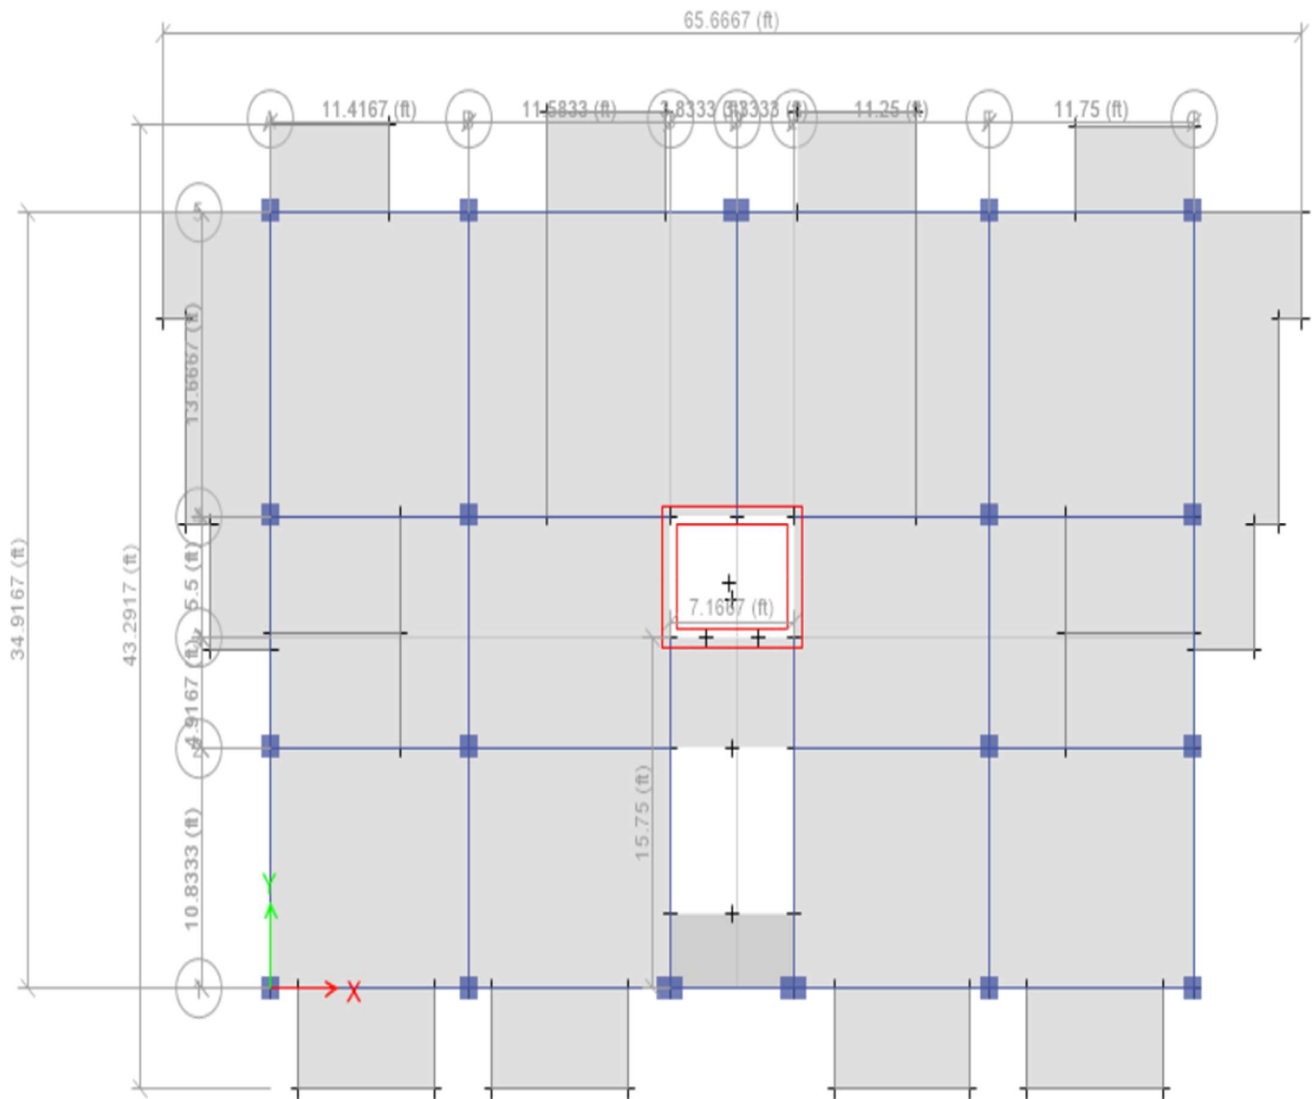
FLOOR PLAN (1ST FLOOR - 4TH FLOOR)
